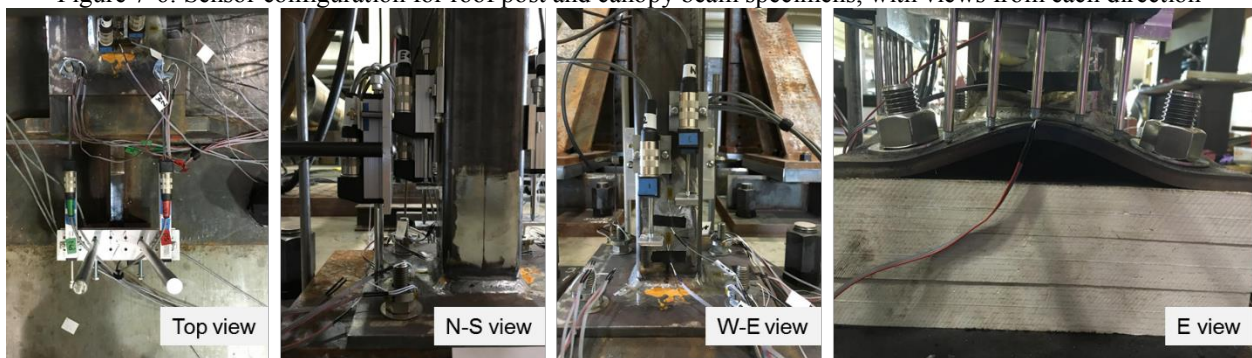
Photographs of instrumentation plan from top, North to South, West to East, and East (east view is on a deformed specimen, demonstrating how LVDT sensors are able to read vertical deformations of base plate)
